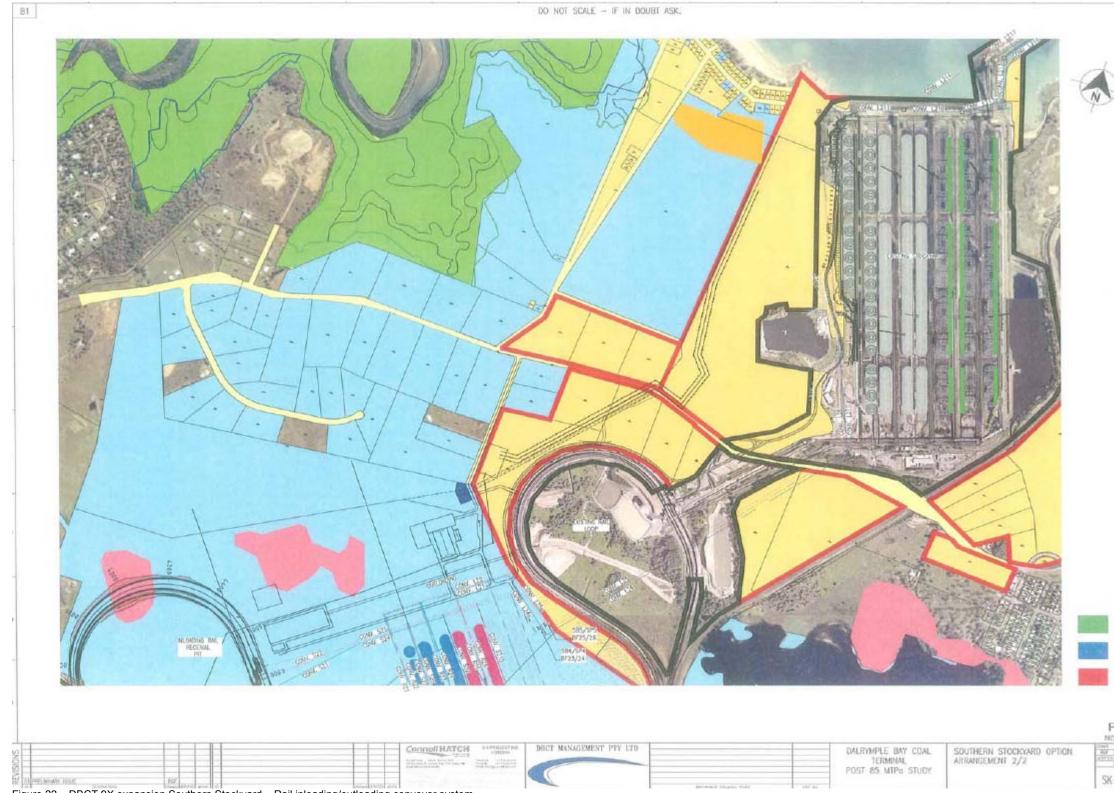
DBCT 9X expansion Southern Stockyard – Rail inloading/outloading conveyor system
